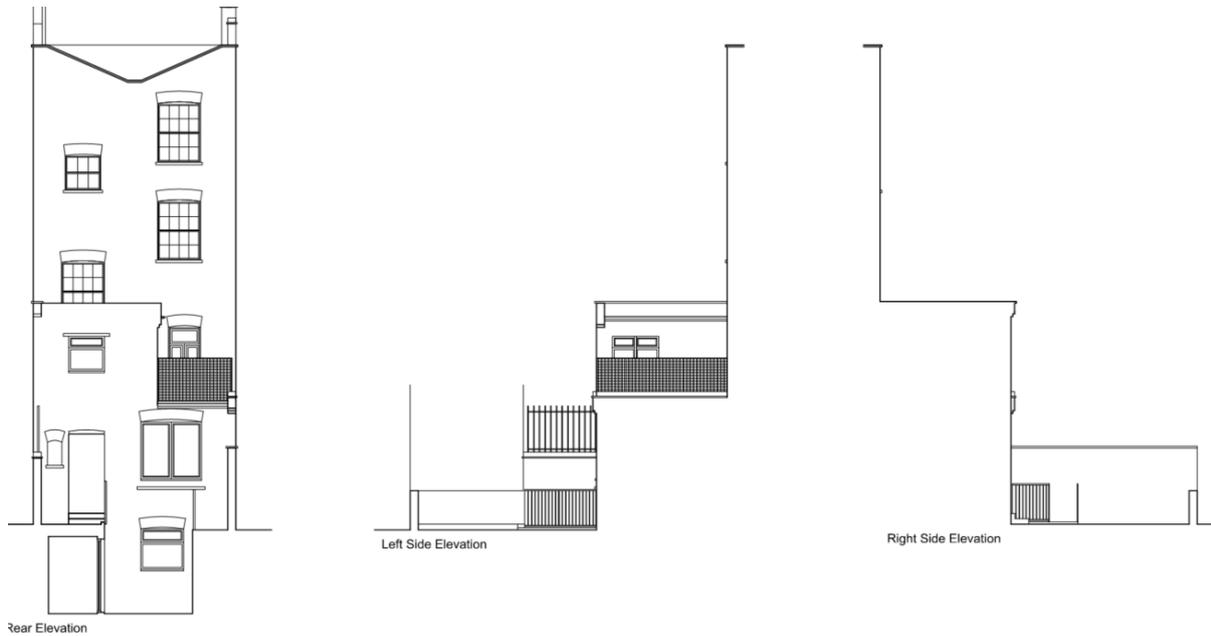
(above): Existing elevations (prior to construction of outbuilding)
